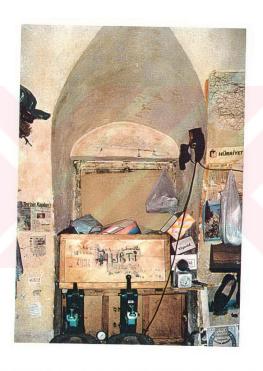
Arch over the window of the North wall of Space 17 (First Floor)
